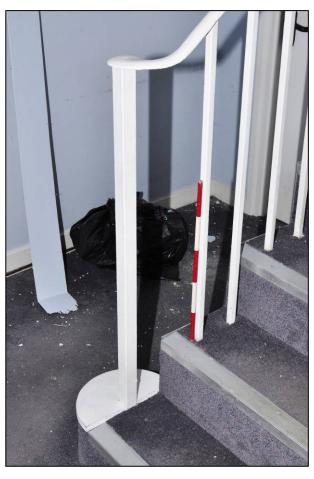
West range, later part, room G27, staircase detail, looking SW (photo 1/2995).
